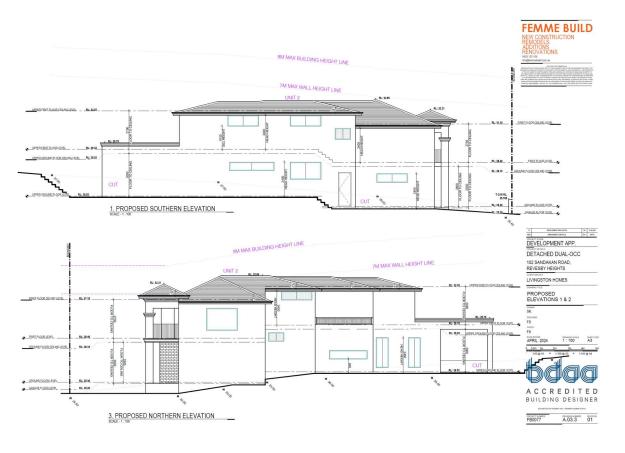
Proposed Southern & Northern Elevation (Source: Femme Build)
